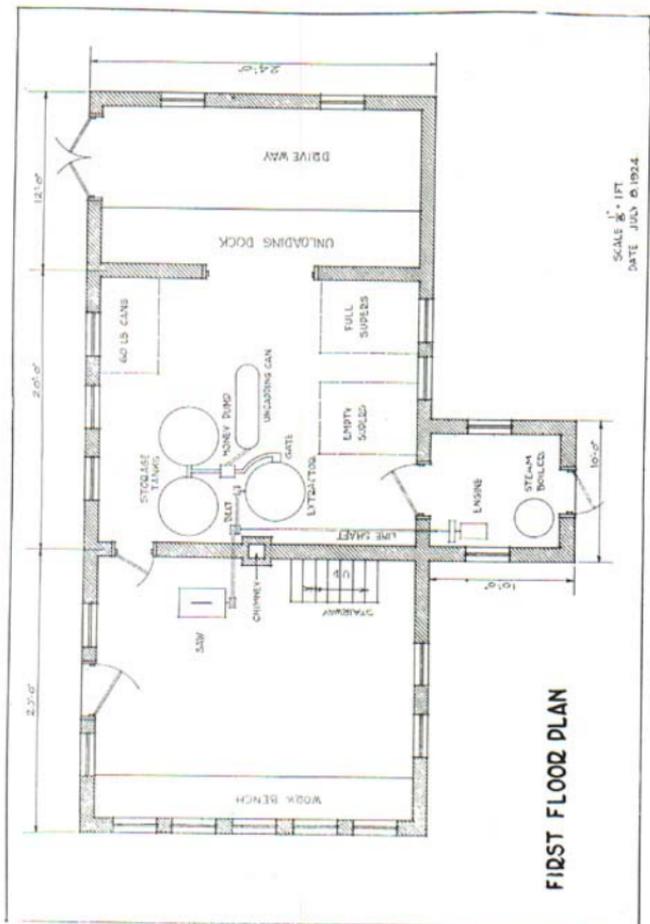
Floor plan for those who wish to drive their truck into the honey house.
